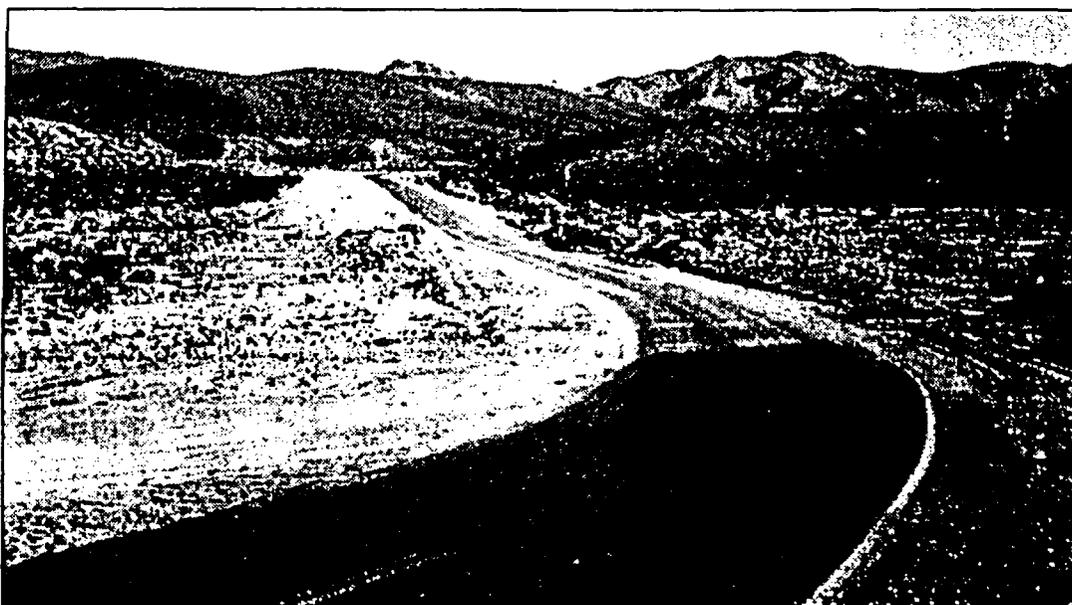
H-Road crossing Fortymile Wash, Nevada Test Site. Debris from runoff of March 11, 1995, was bulldozed to both shoulders of the road. Site is where NTG worker was swept downstream.
